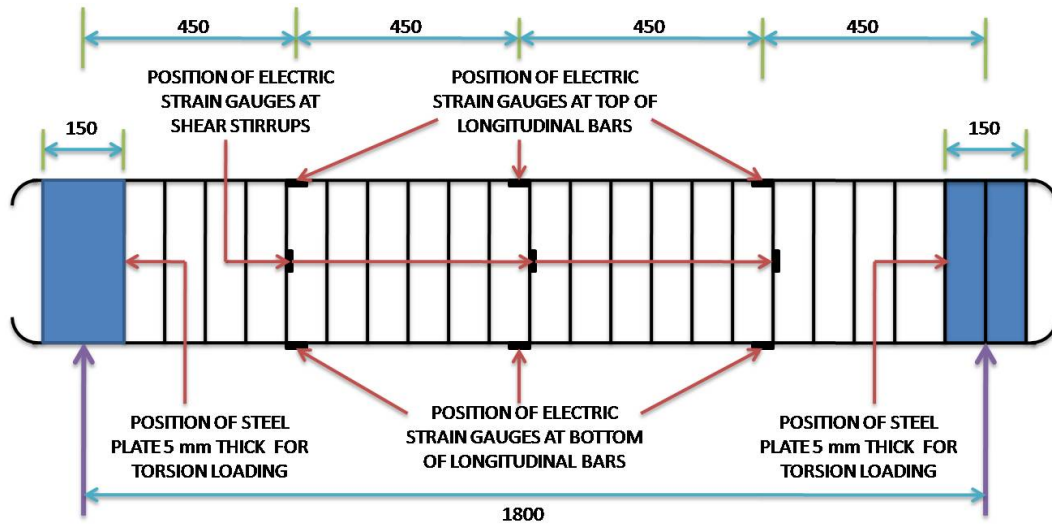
Schematic Diagram Beam PTR – 1 showing Reinforcement, Electric Strain Gauges and Steel Plates at Both Ends for Torsion Loading
